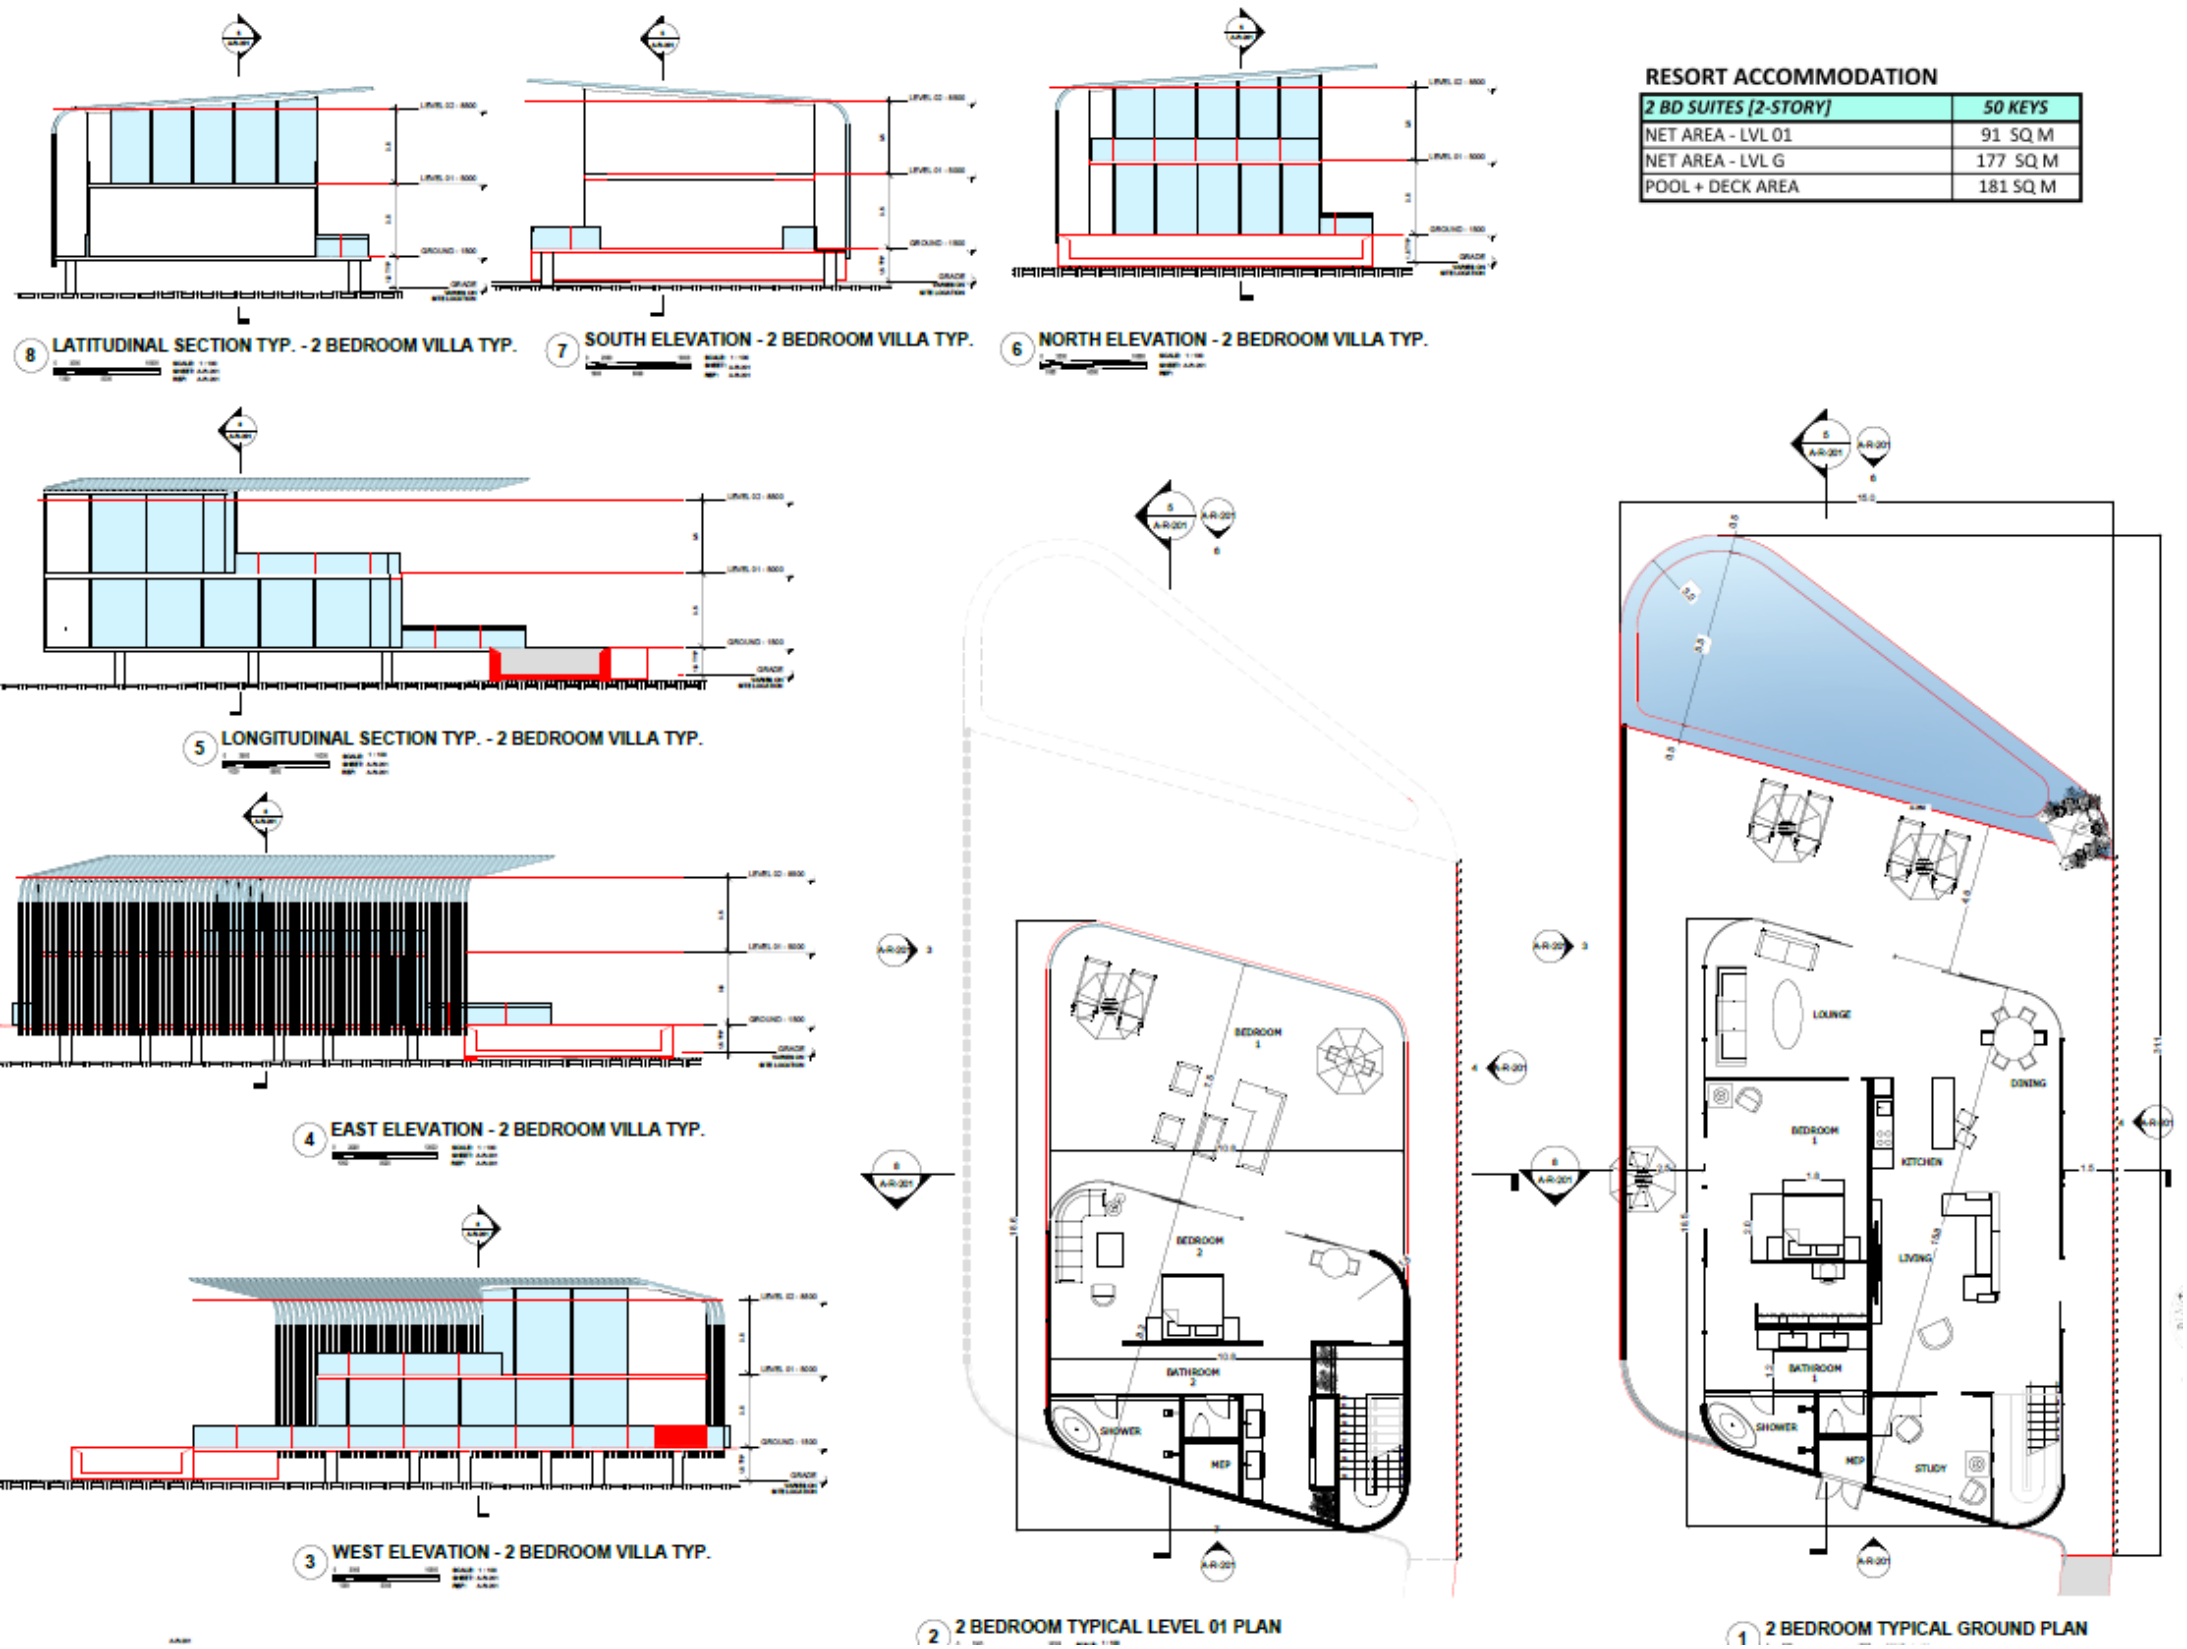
Resort 2-bedroom suite plans, elevation, and sections
